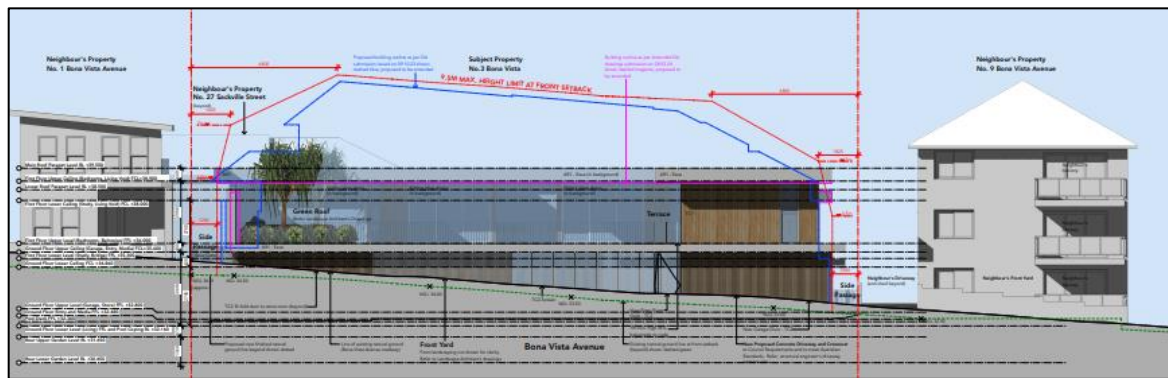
Western Elevation of subject Development (Street frontage) – 3-7 Bona Vista Avenue (Source: Dominic Levene)
